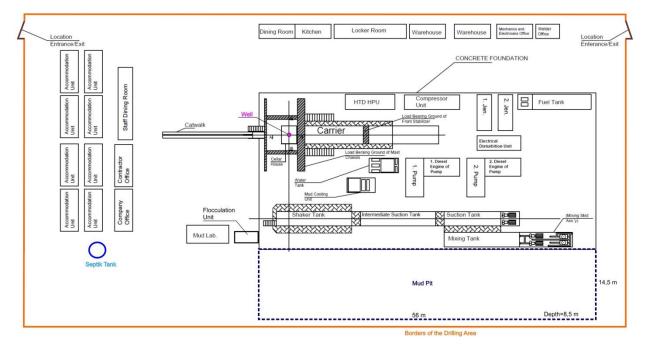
The Schematic View of Layout Plan of the Drilling Area
